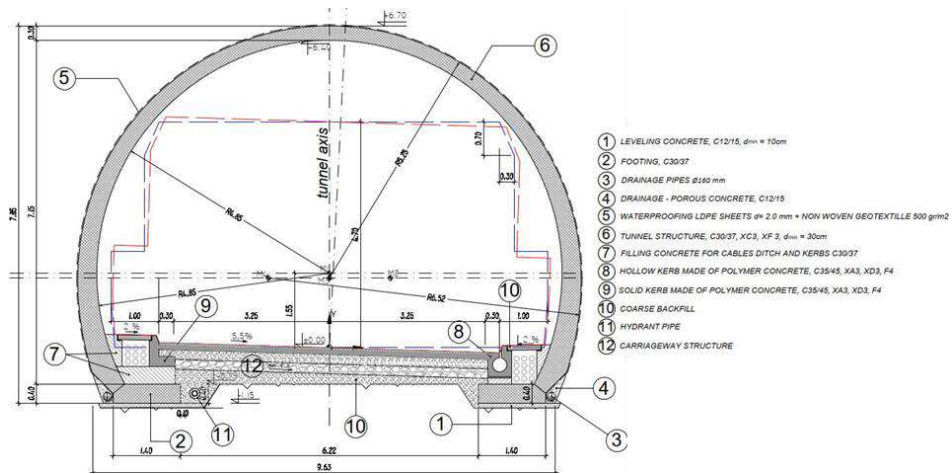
Typical cross-section of the final (secondary) lining for a two-layer tunnel lining (Source: Spasojevic, 2022, 2025)
